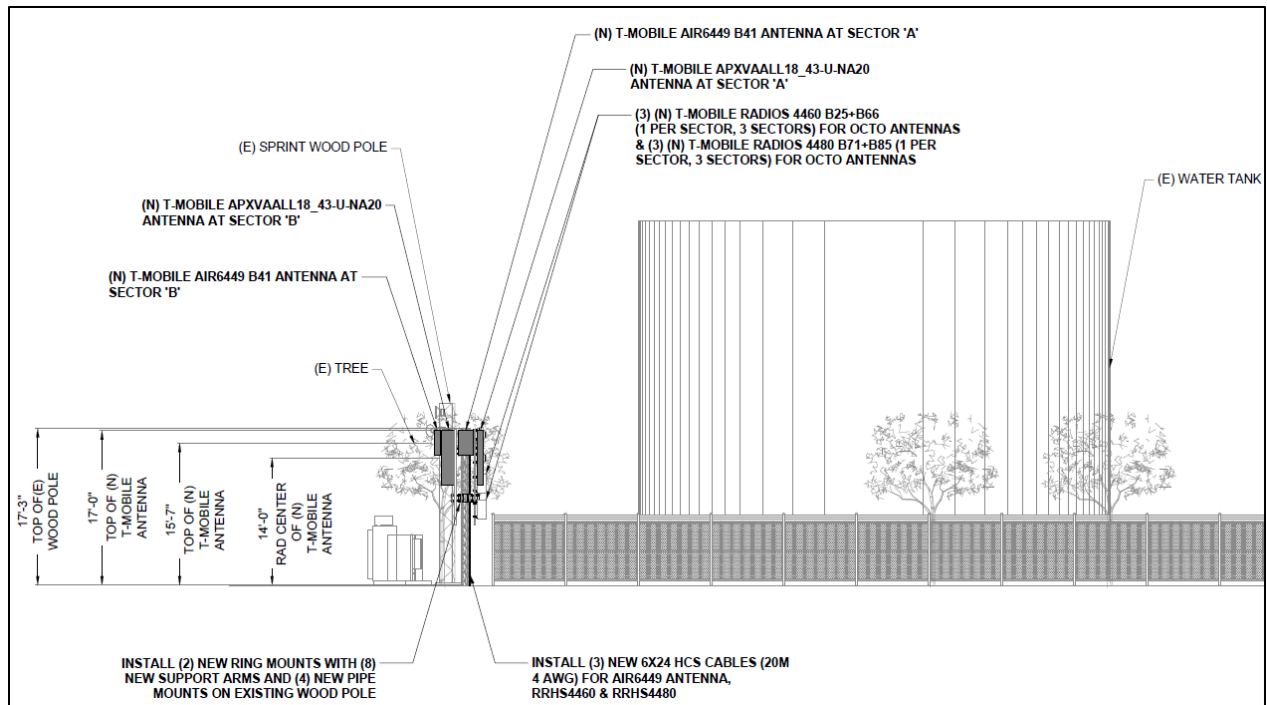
Proposed antenna layout plan on the Monopole (Source: Plans, page A-4, panel 1).
